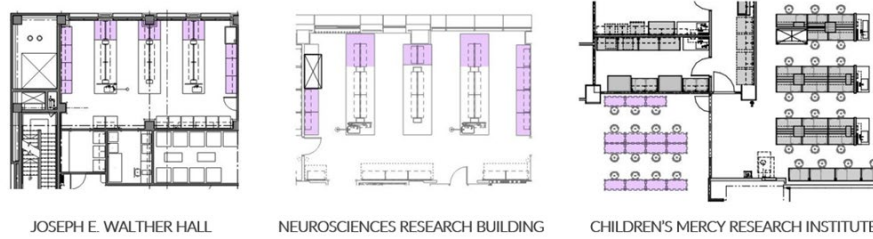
An example of lab workstations transitioning outside the laboratory environment within a typical floor plan.
